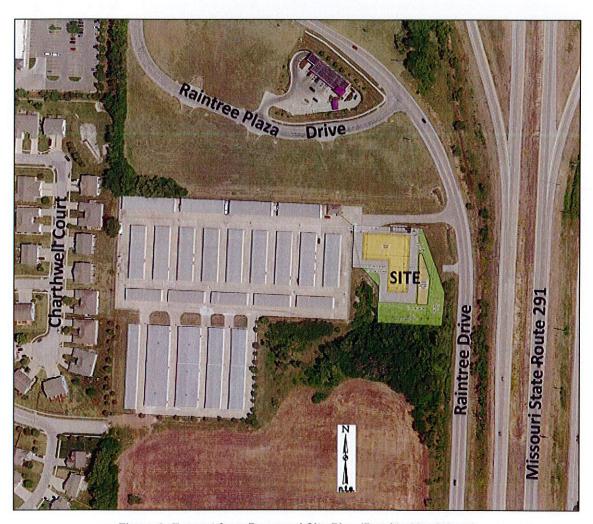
Excerpt from Proposed Site Plan (Provided by Others)
